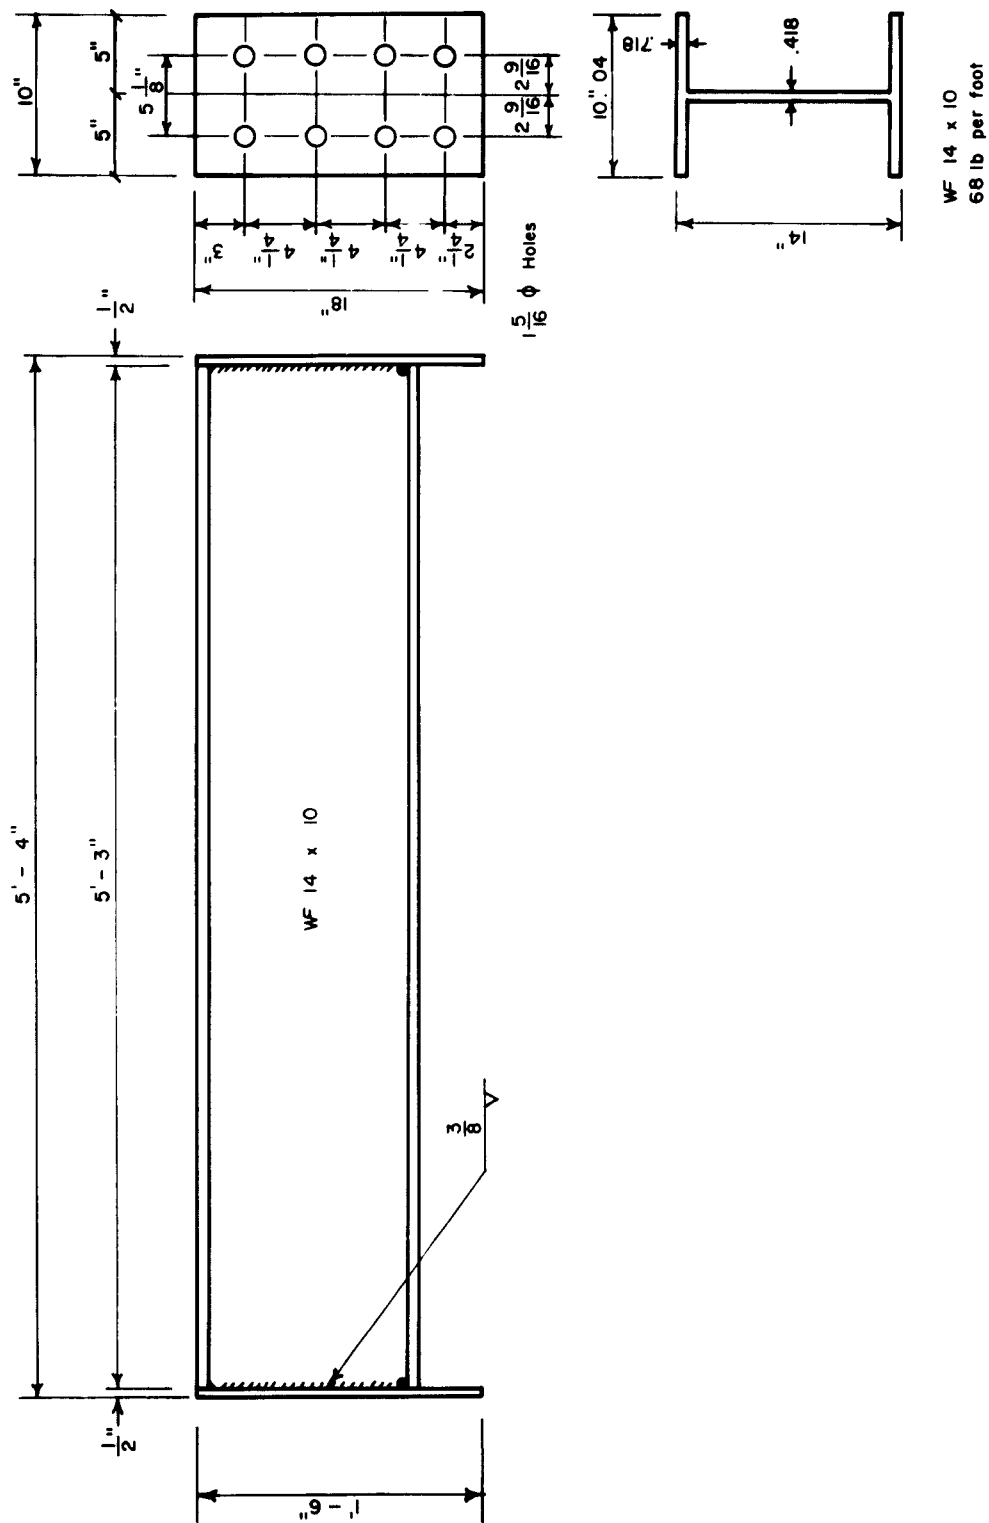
LOADING BEAM WITH CONNECTION PLATES
